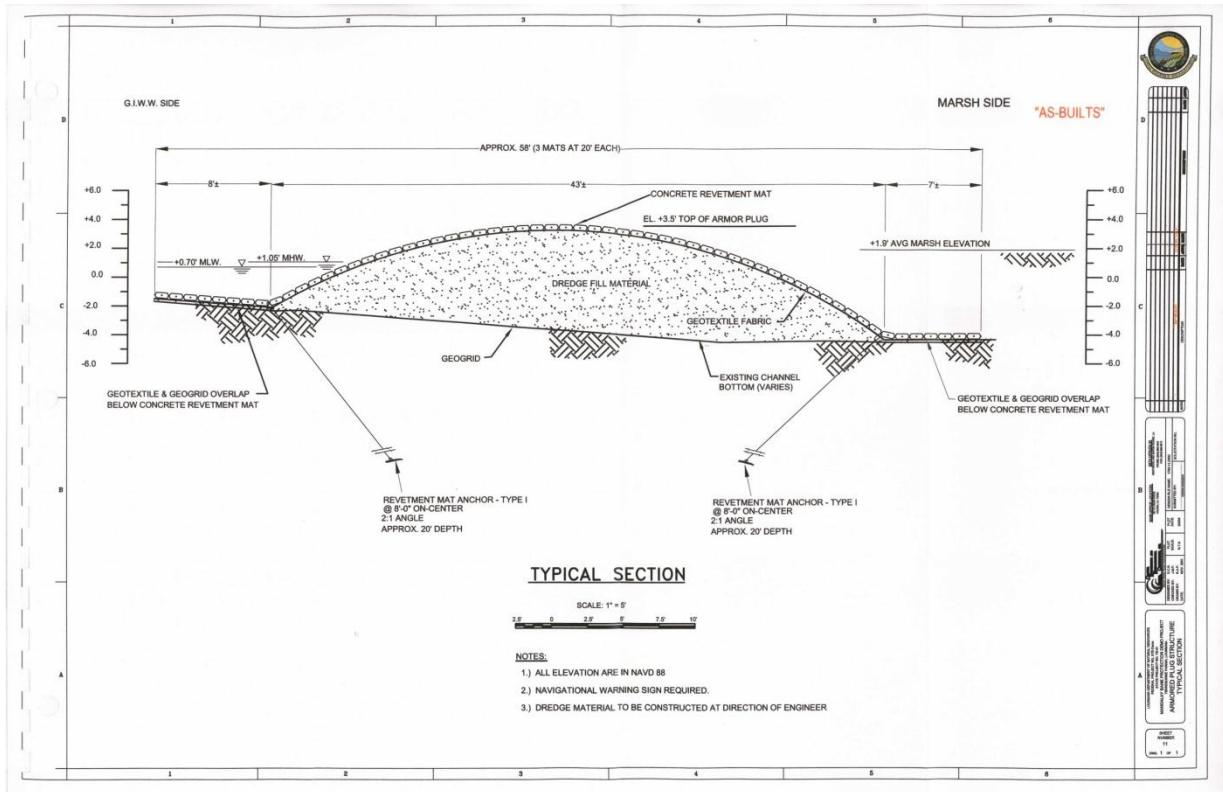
Typical cross sections showing the Mandalay Bank Protection Demonstration (TE-41) project's concrete revetment armored plugs.
